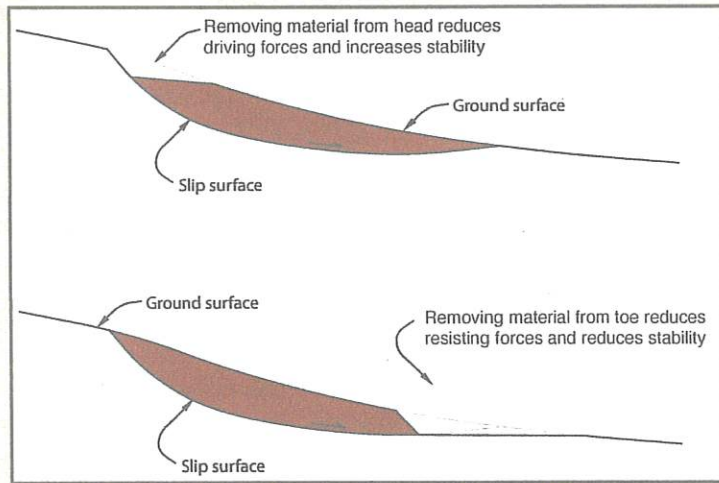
, C2, and C3 provide a cross-sectional view, in schematic form, of general principles for slope excavation, showing the effects and consequences of where on a slope the excavation takes place. These graphics are general in nature, and a geotechnical engineer or other professional should always be consulted if possible.
